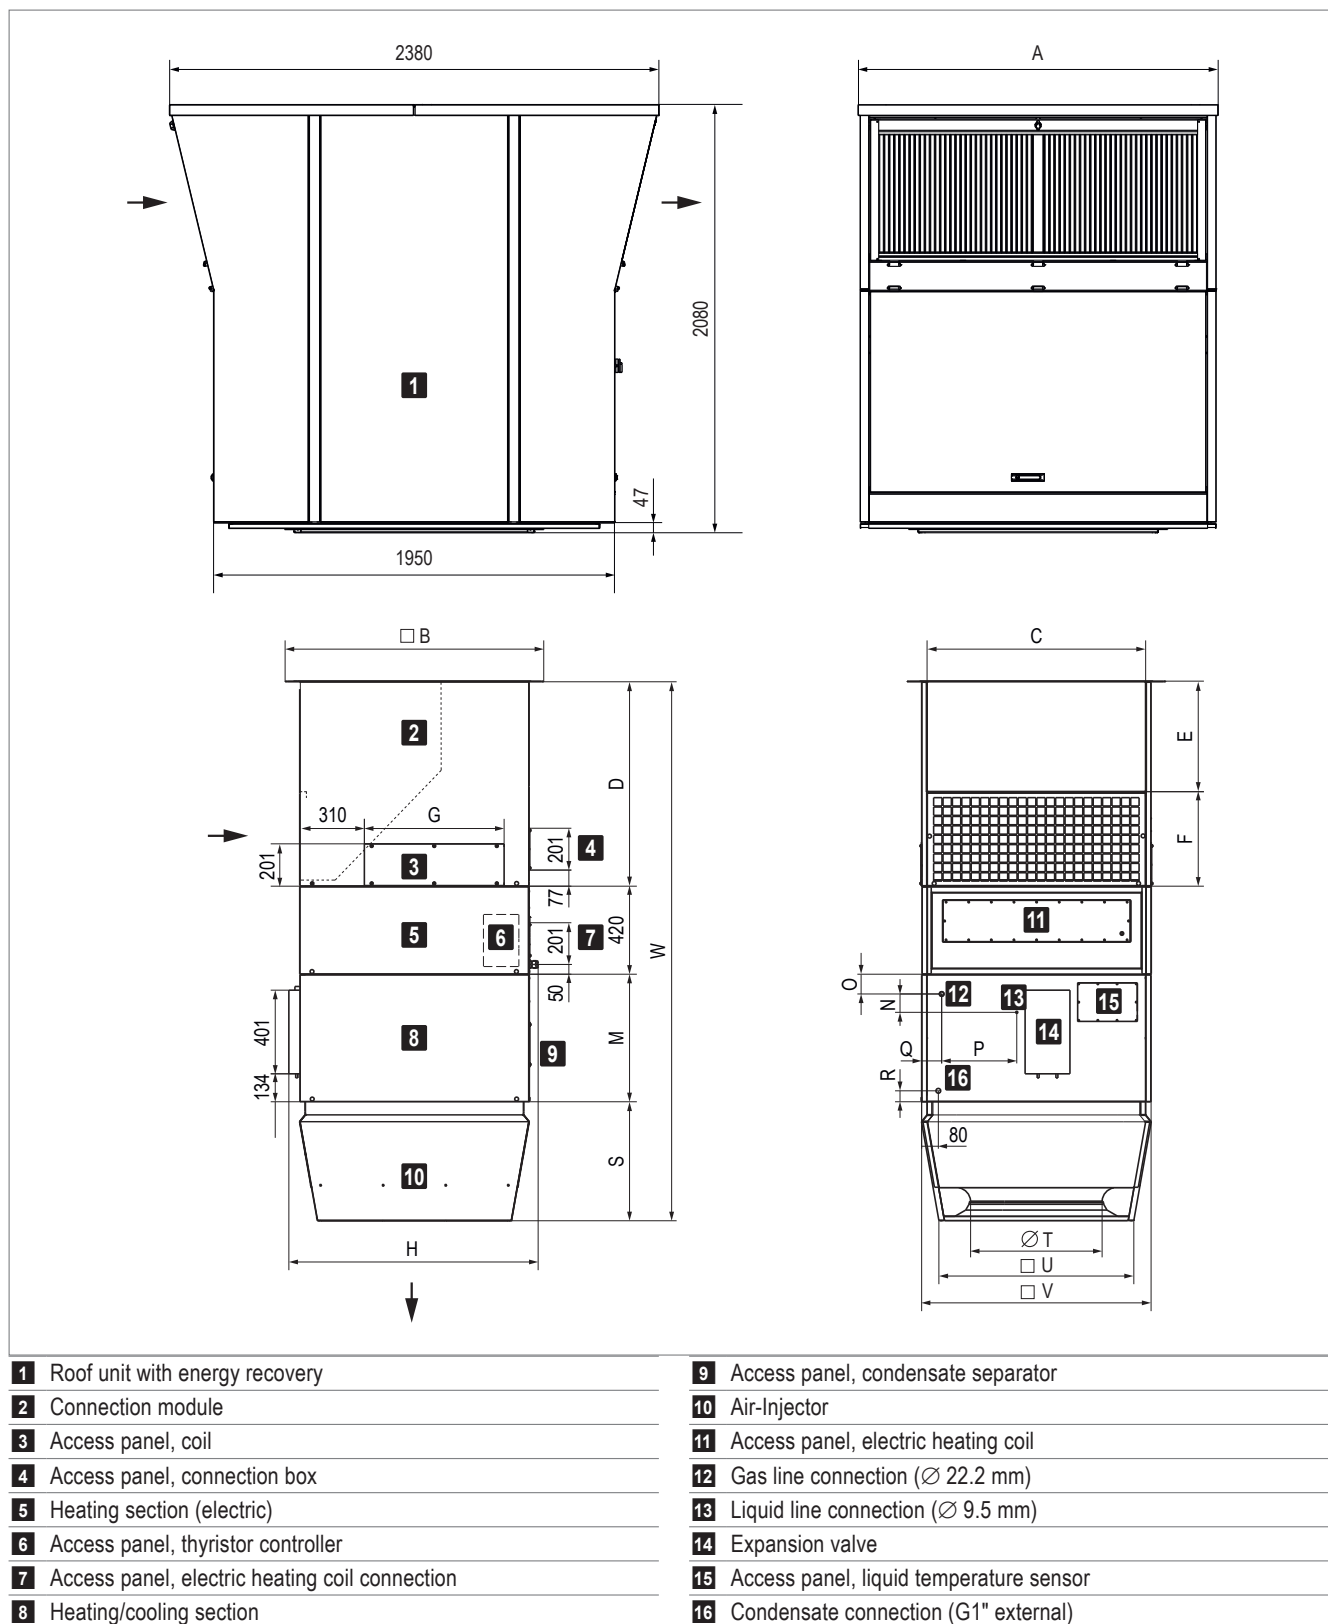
RoofVent® RP-6SK, RP-9RK, RP-9SK dimensional drawing (dimensions in mm)
